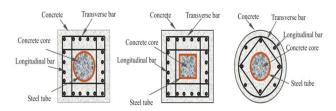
Commonly used cross sections of concrete-encased CFST columns.
